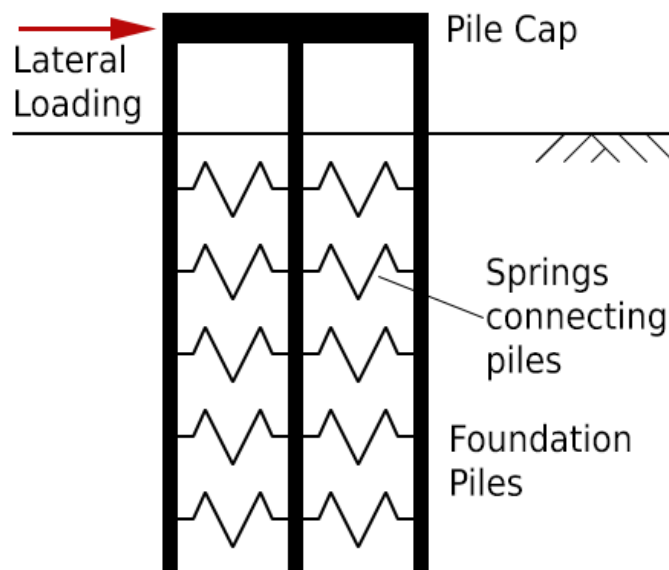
Example coupled Winkler beams in order to model laterally loaded pile groups
